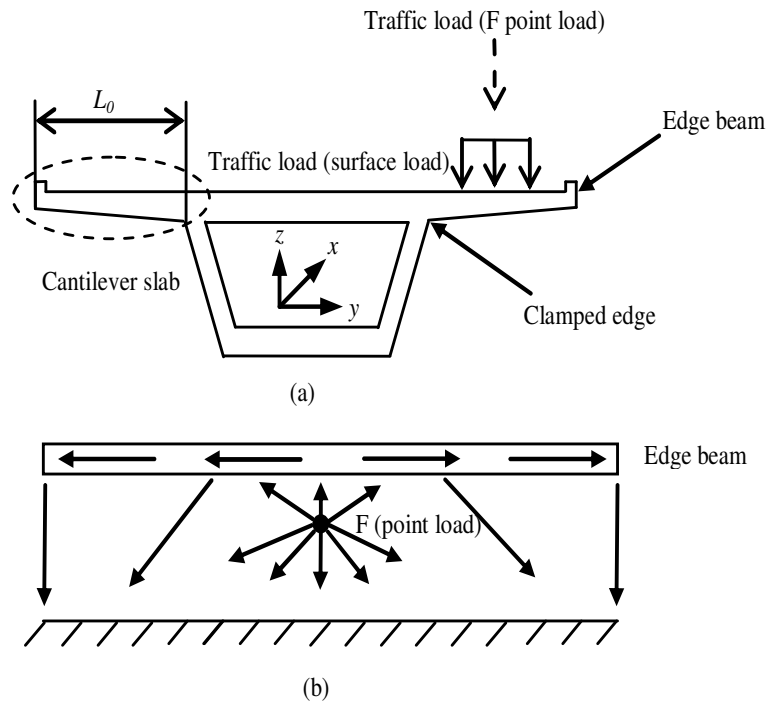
Cantilever slab of a reinforced concrete bridge: (a) axle loads modeled as concentrated loads (b) axle loads modeled as distributed loads
